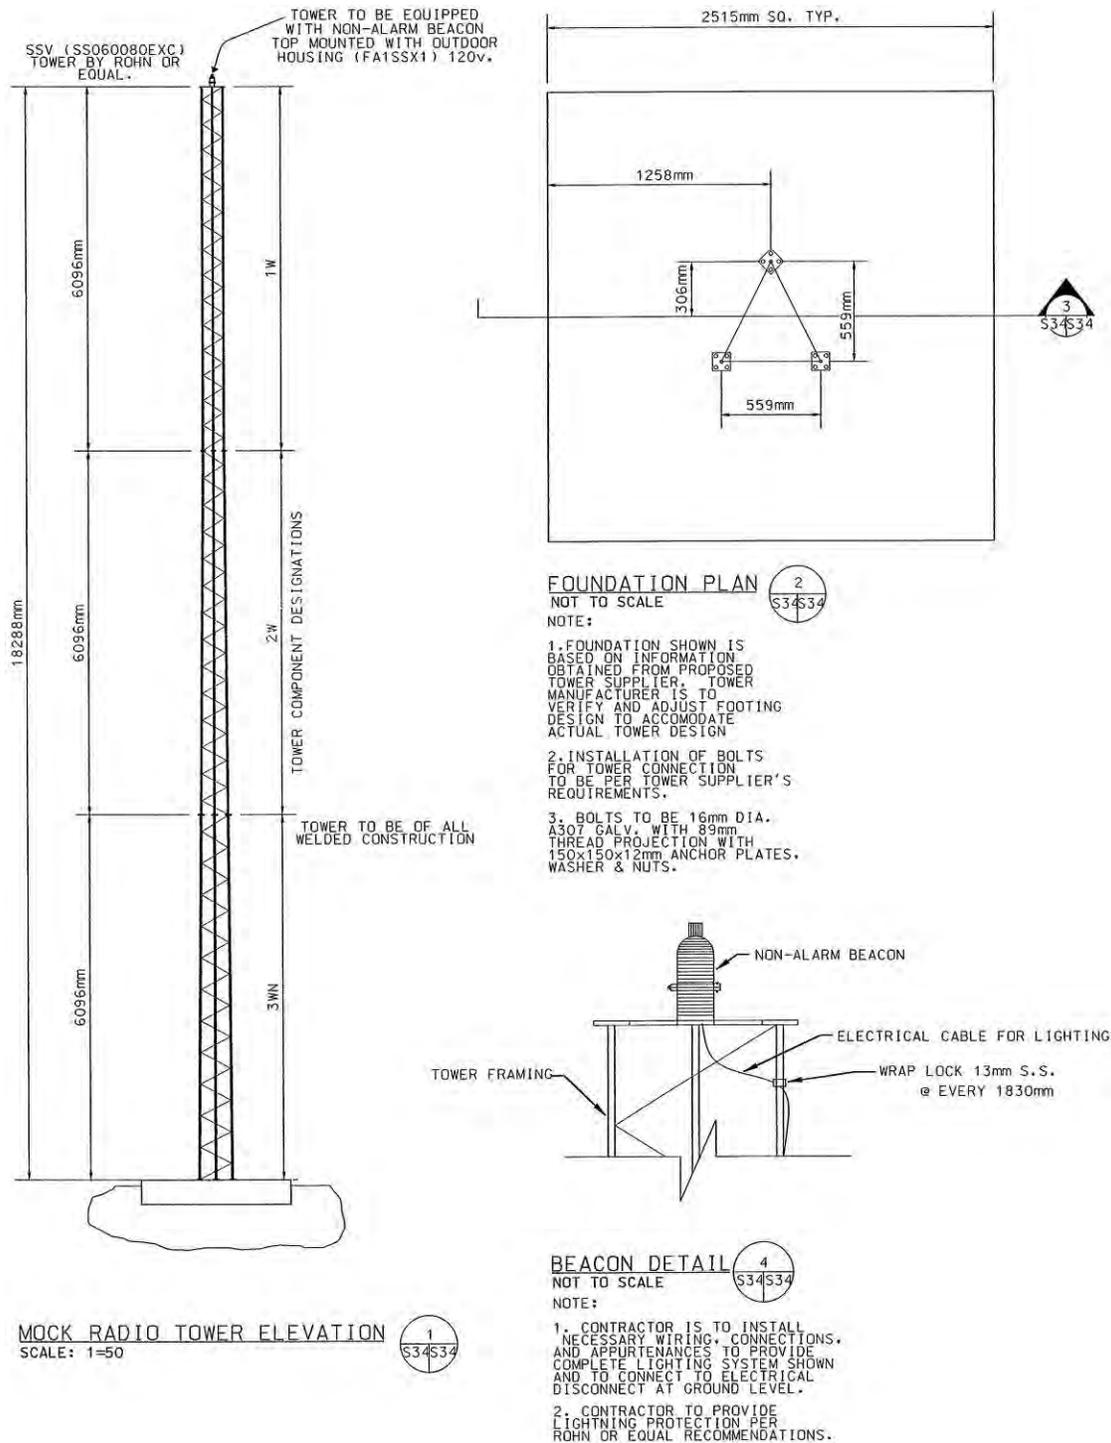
MOUT training complex mock radio tower foundation plan, elevation, and beacon detail, Fort Bragg, NC, 2002 (standard drawing 179-97-01 S-34 sheet 124; military operations in urban terrain, MOUT training complex, mock radio station tower foundation, elevation, and details; 29 January 2002).
